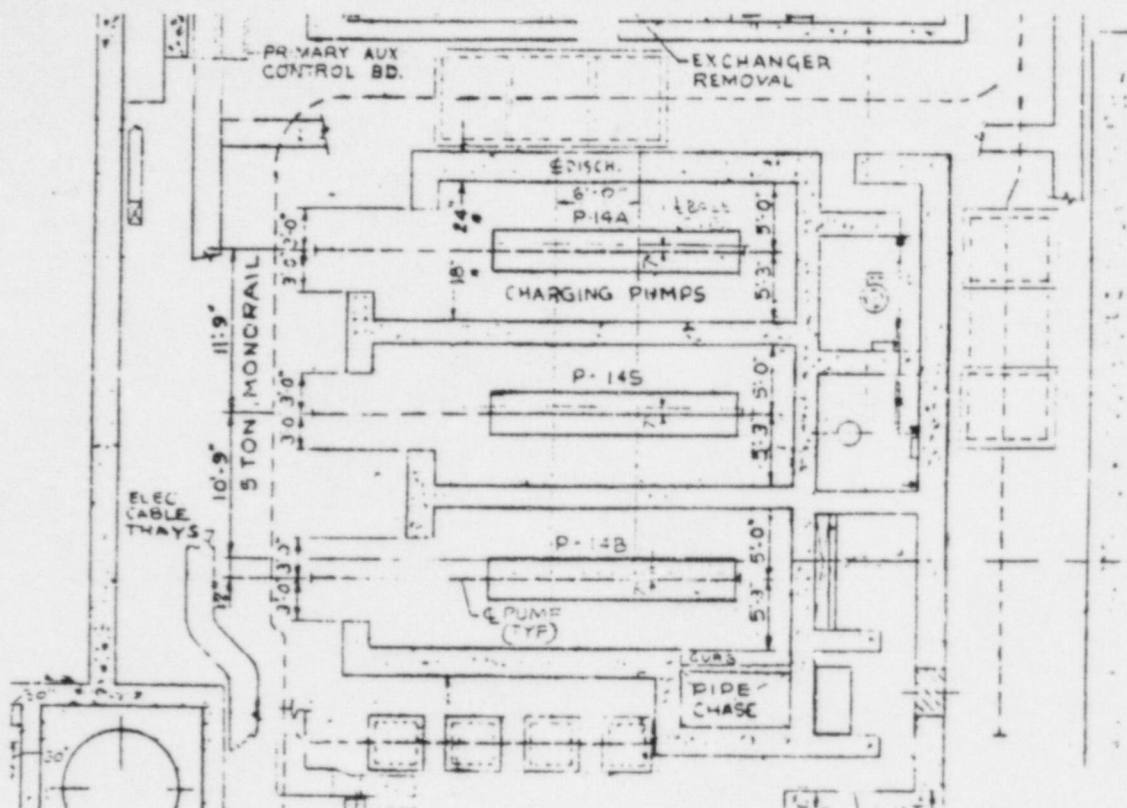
Plan and Elevation of Primary Auxiliary Building Showing Critical Equipment Locations.
